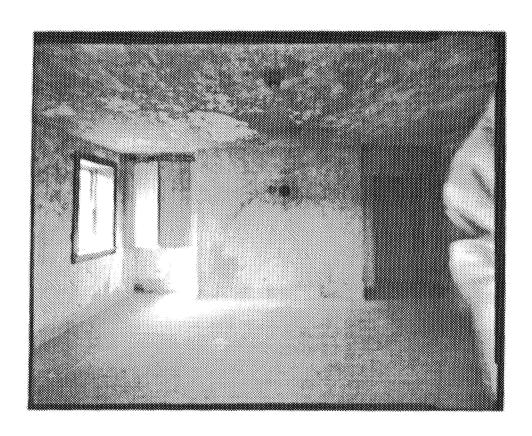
Hampton Quarter 3, first floor: view of northeast stove wall of southwest room looking northeast.
